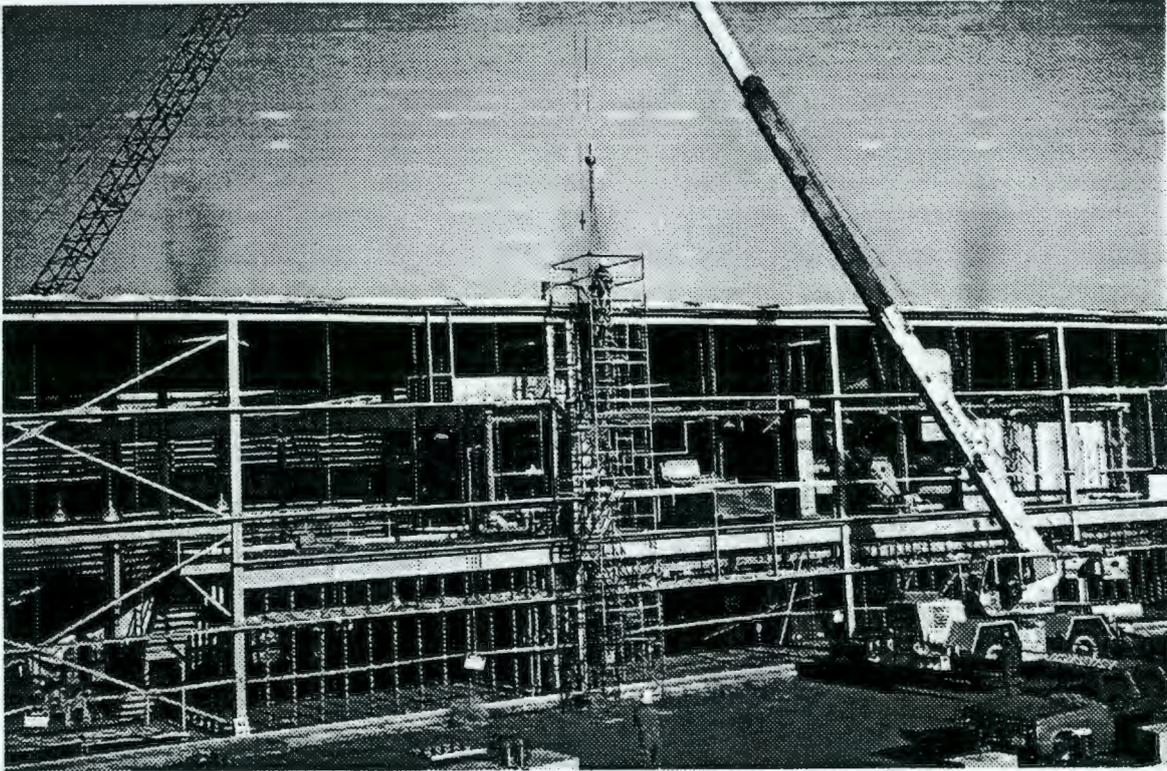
Steel Dismantlement of the 190-C Structure with Hydraulic Sheers, View Pointing Northwest.
